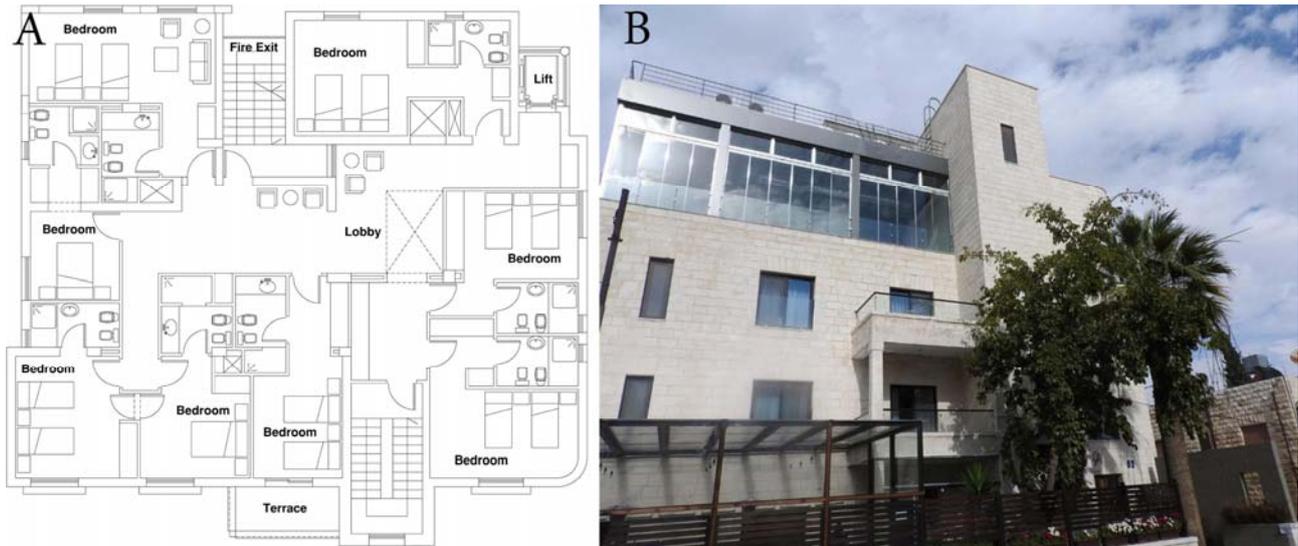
A — Second-floor plan of the guest rooms. B — Locanda Hotel building after facade modification and the addition of glass surfaces (source: <https://locandahotel.com/en/>)
